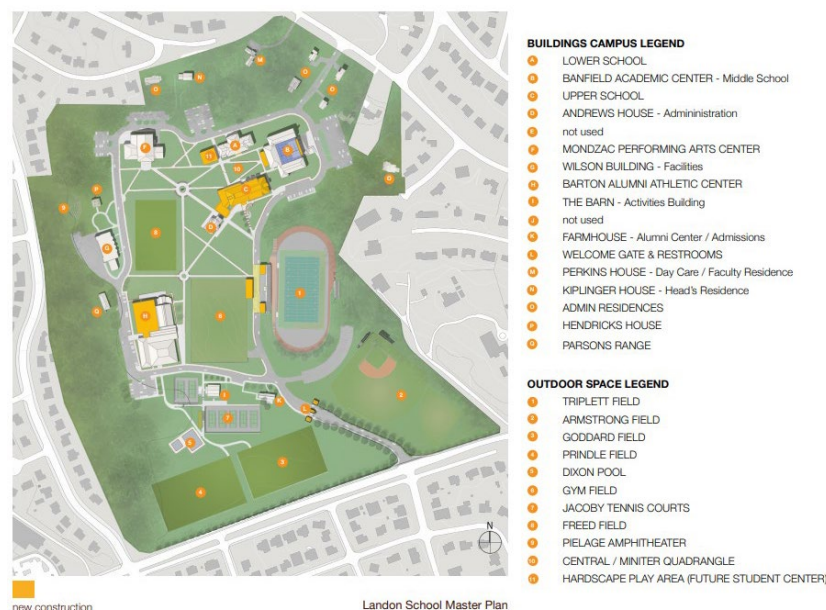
Landon School's proposed Campus Master Plan Summary Report, Page 37
